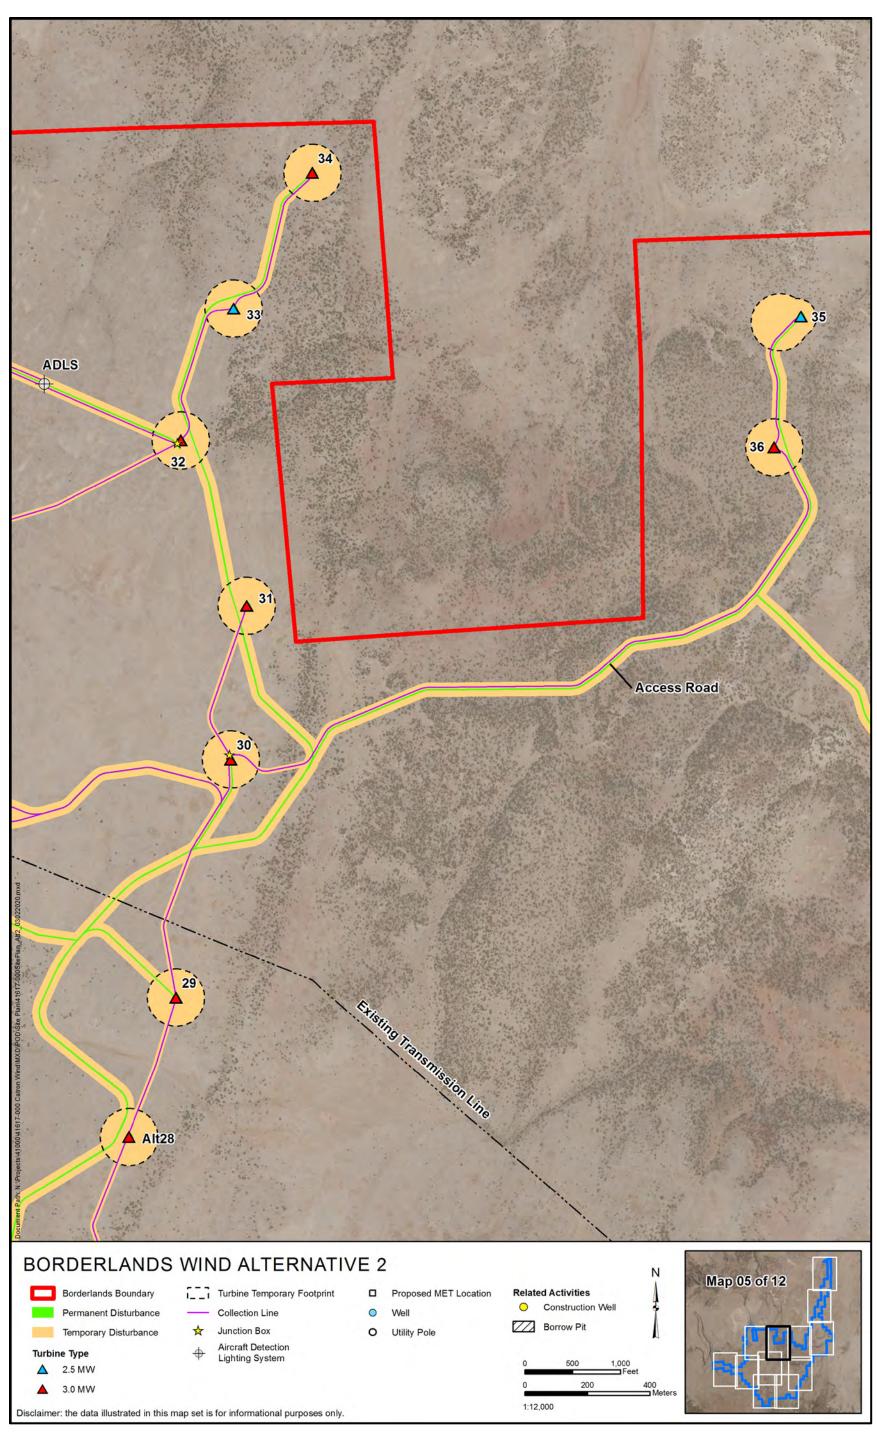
Alternative 2 Site Plan (Map 5 of 12)
